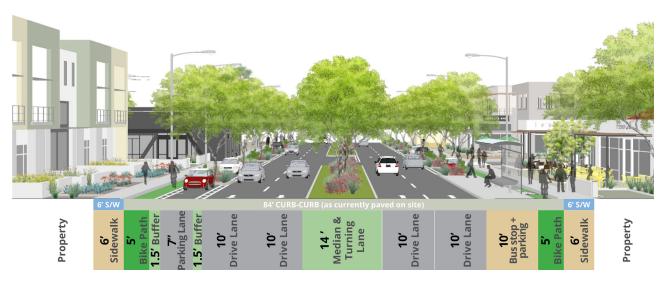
Existing and Proposed Street Design for Cesar Chavez Boulevard
